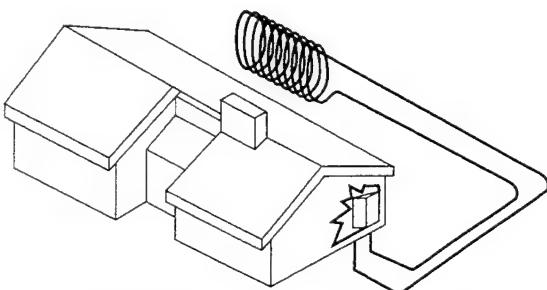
Diagram of Alternative Underground Pipe Systems
